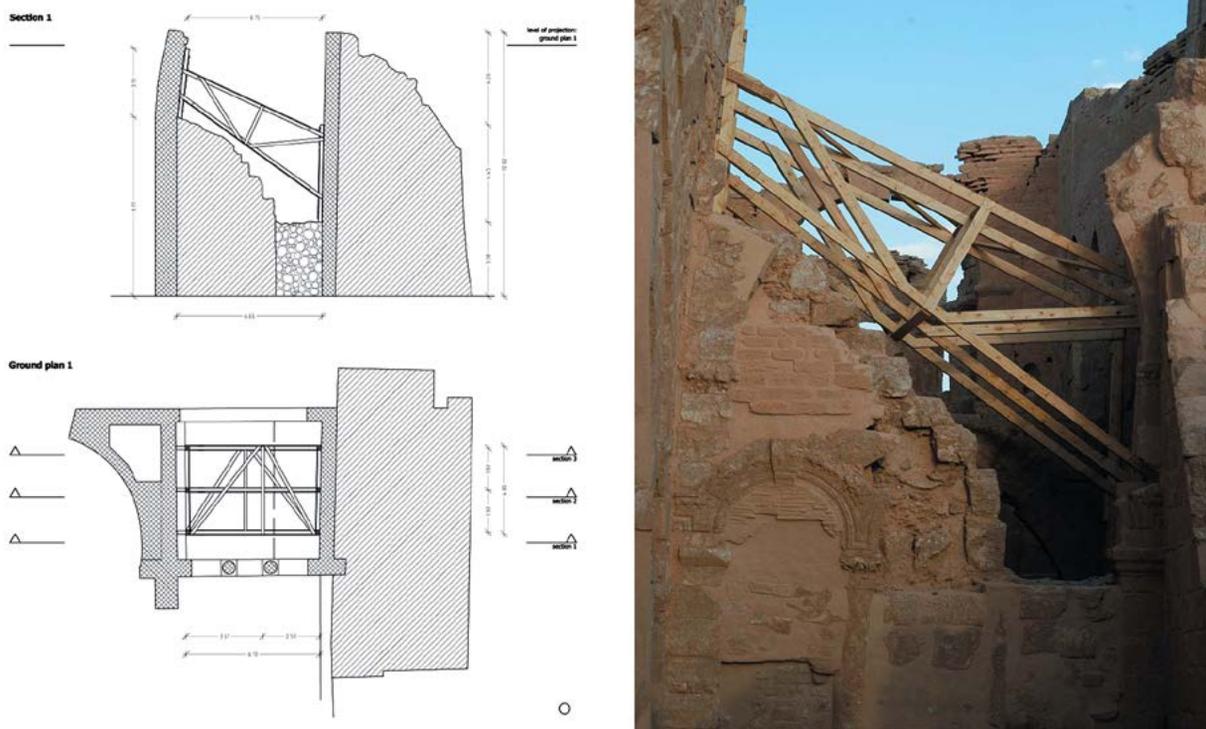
Resafa, Tetraconch Church, scientific reconstruction (I. Salman 2013).
